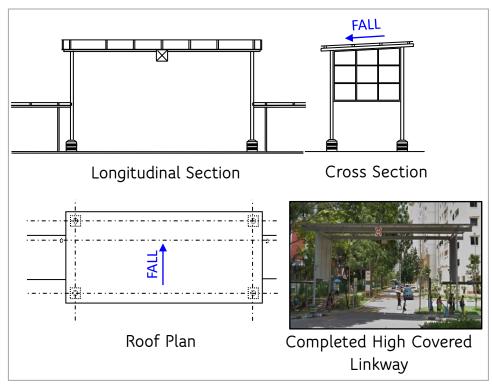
Plan Presentation for a Typical High Covered Linkway
